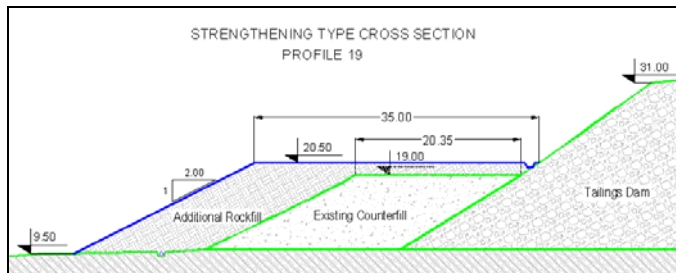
Strengthening of the existing tailings dam. Profile 19 type cross section.
